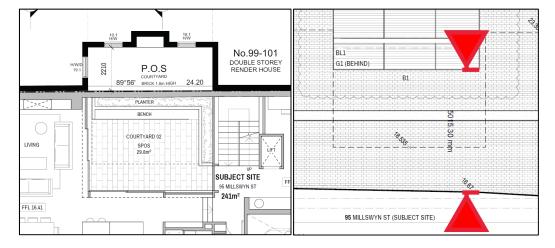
proposed widening of the light court (left) and lowering of the north boundary wall (right)
